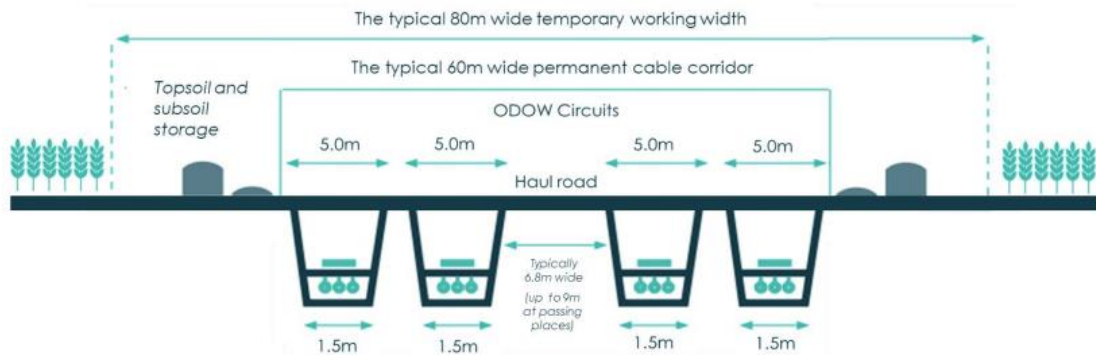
Example onshore cable construction corridor cross section for 4 cable circuits (12 cables)
